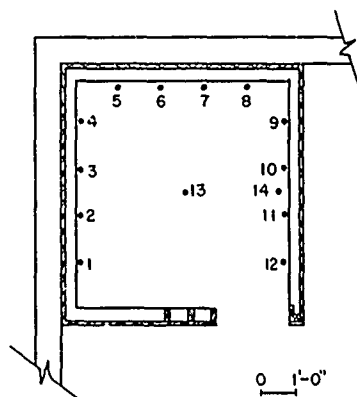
Film dosimeter locations in basement corner-room shelters in two-story houses; Stations 1-31.1 a-1, a-2, b-1, and b-2.
